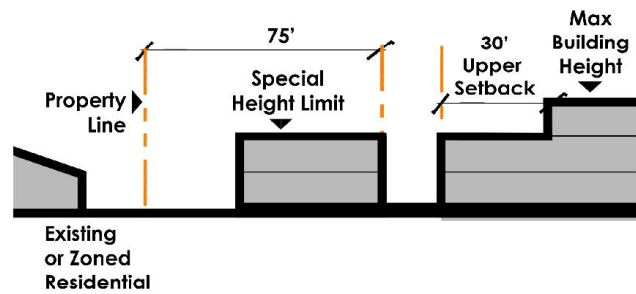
SPECIAL BUILDING HEIGHT LIMITS -
